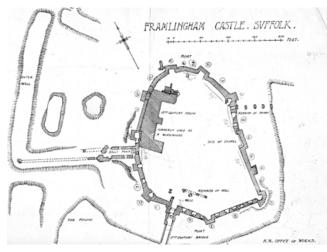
A site plan of Framlingham Castle dated 1919, showing the location of the workhouse, comprising buildings of the late 16th century, 1664 and 1729. (TNA WORK 14/685)
